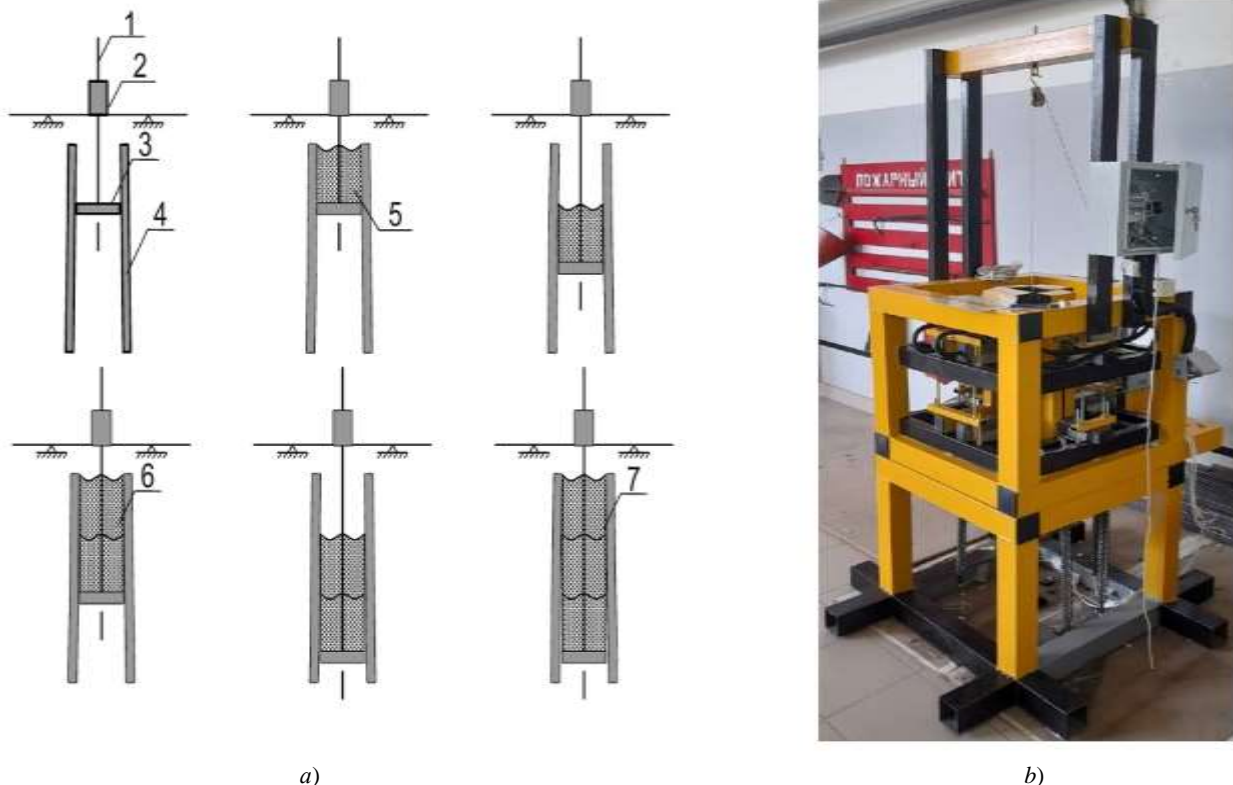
a) method of forming reinforced concrete structures by means of lowering concrete (patent 2566540):
